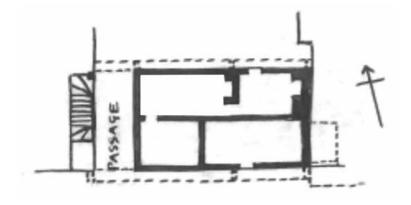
RCHME sketch plan of the ground floor of the Church Loft, 1910
